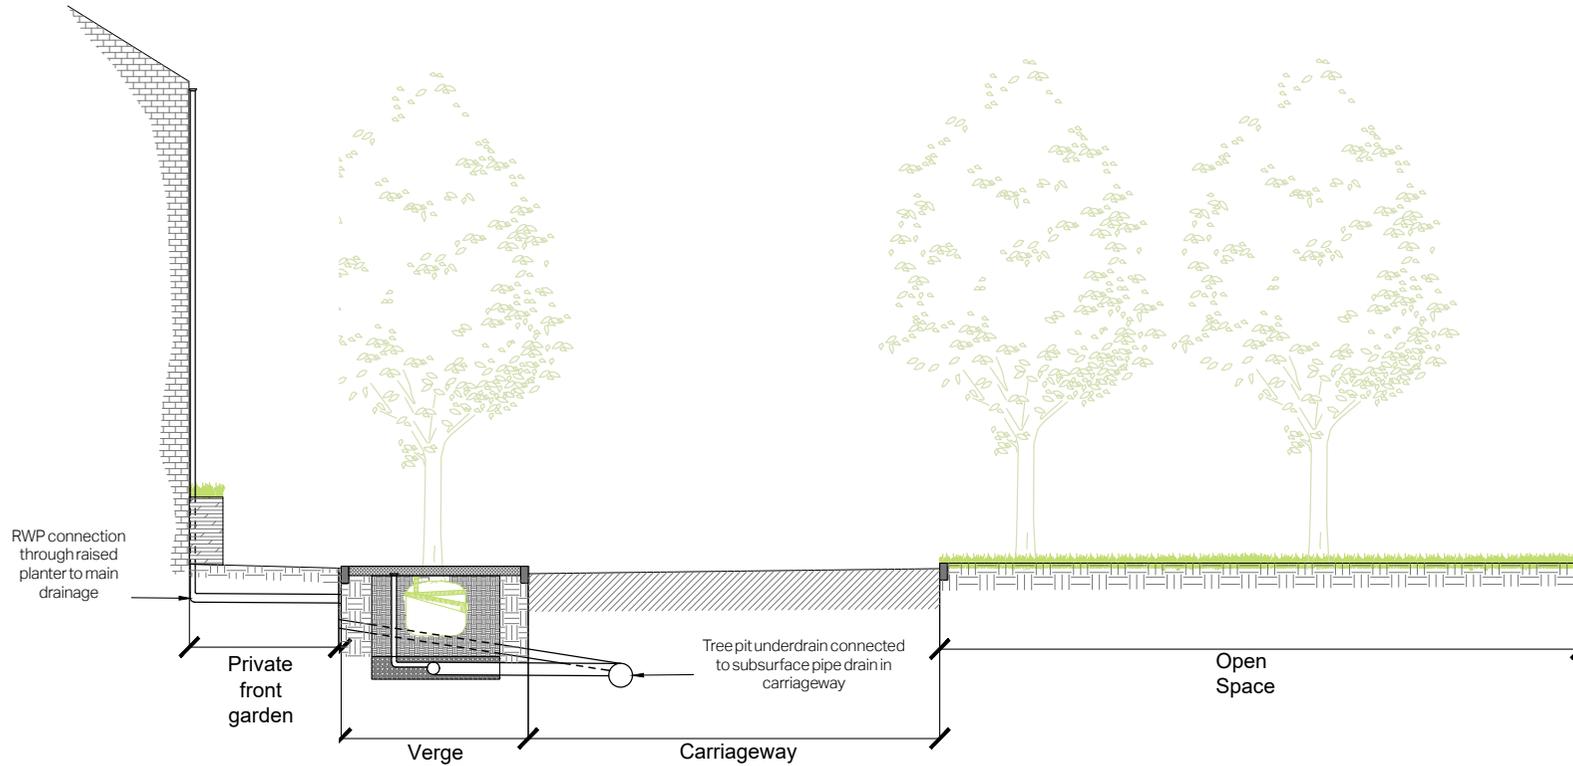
Edge lane overlooking basin in open space (source: Susdrain)
